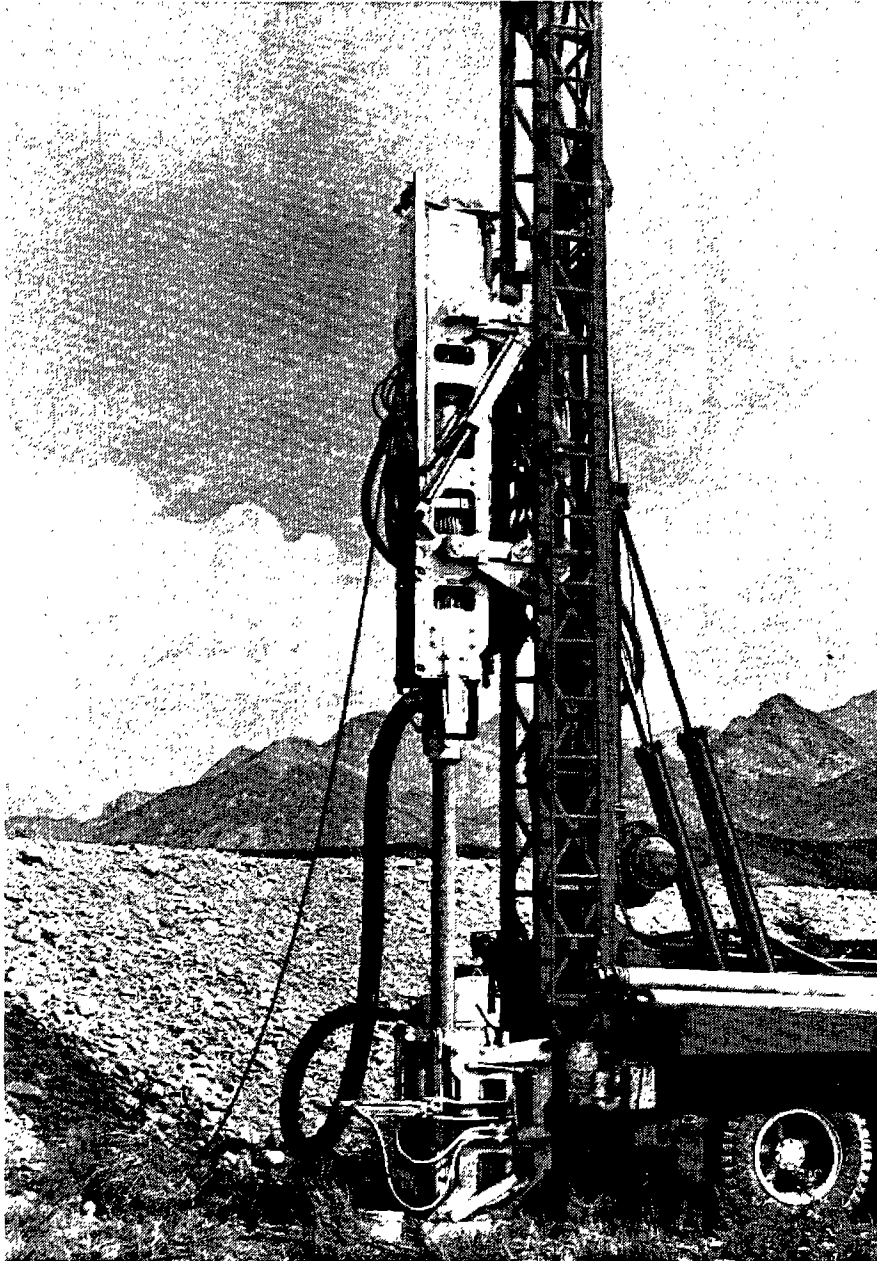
PHOTOGRAPH OF BECKER HAMMER DRILL RIG
